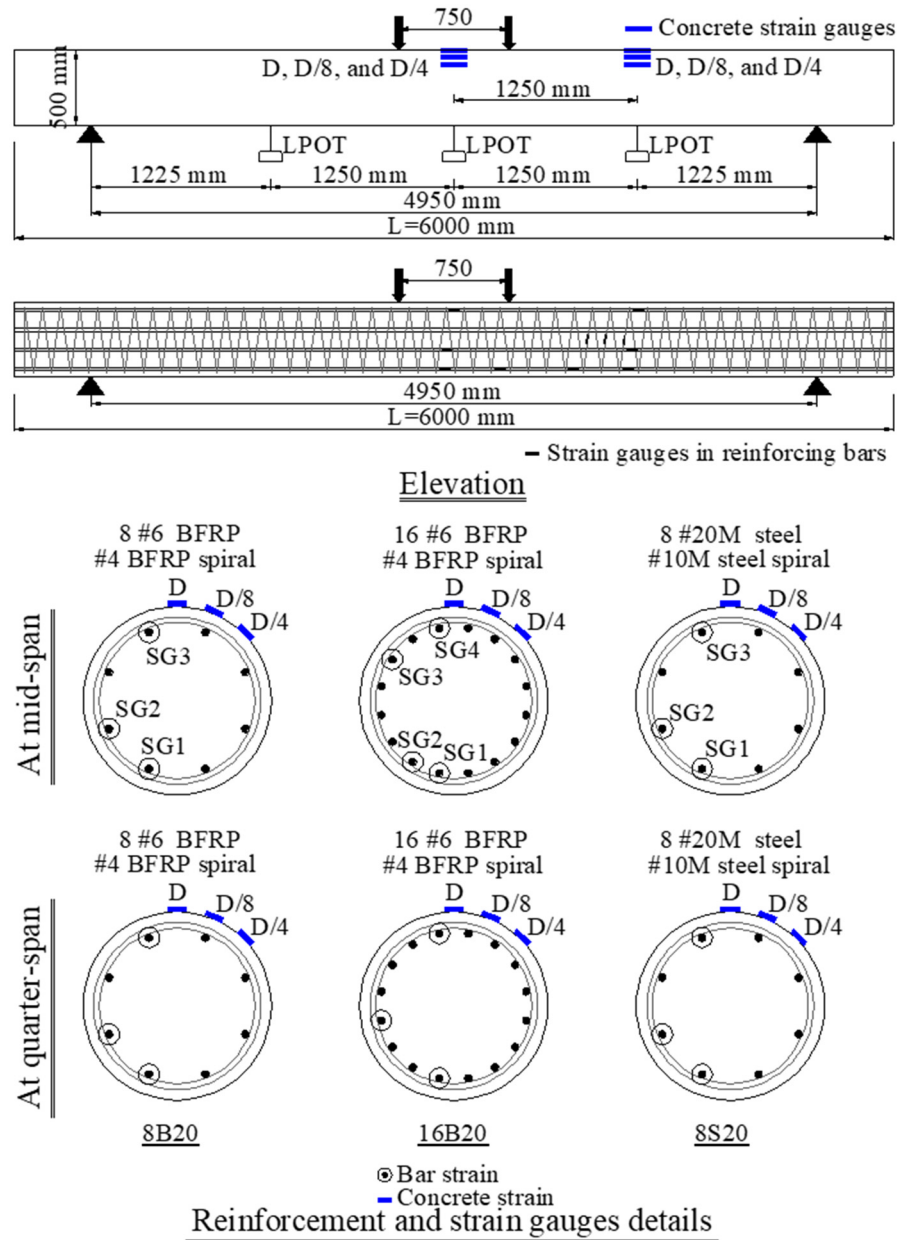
Dimensions and reinforcement details of the specimens (dimensions in mm).
